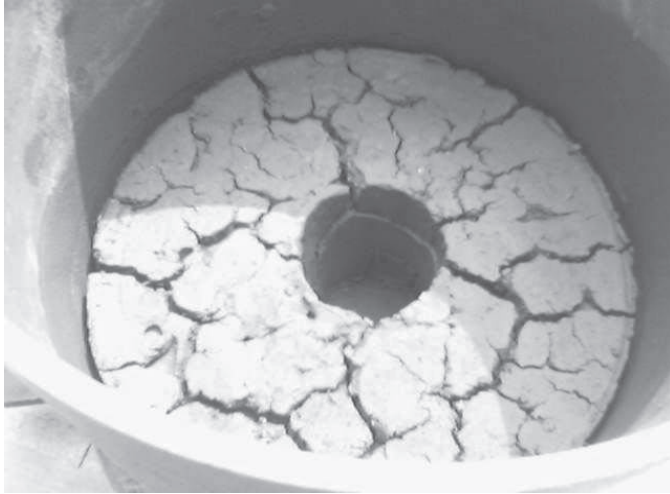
Shrinkage cracks in compacted expansive soil on desiccation.
